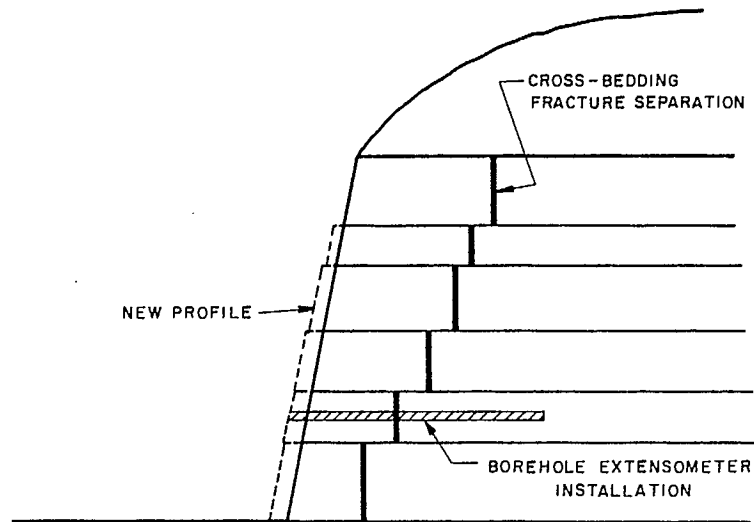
Installation of rock bolt extensometer in pre-split wall adjacent to roadway to test for stability.
